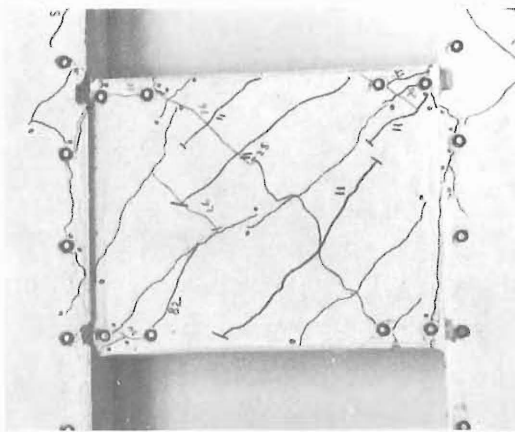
TOP FLOOR BEAM DURING CYCLIC LOADING
